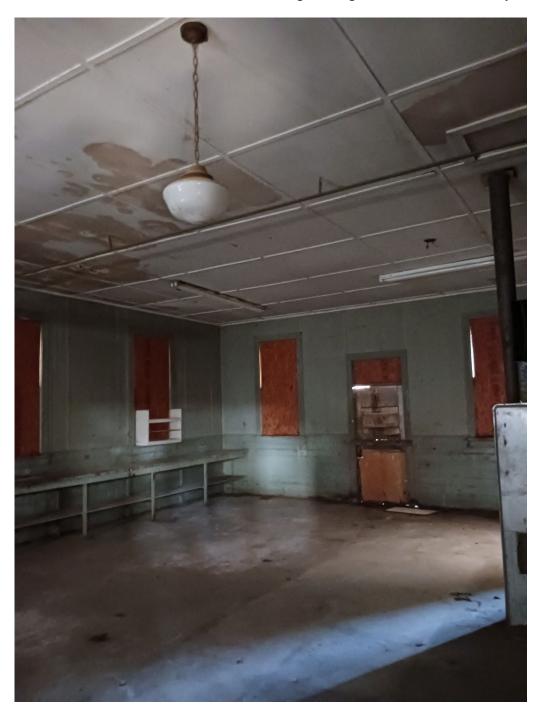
South room of vocational building, looking south. Photo courtesy of David Tucy.
